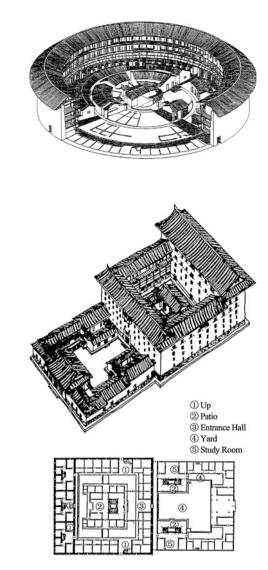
Bird's eye view (upper) and floor plan (bottom) drawings of the Yijing Building in Yongding County, Fujian. The Yijing Building is a famous square-shaped earthen building. The structure of the main body with the "---" type five-story rear part and the "]" type four-story front part surrounds a central single-level building. In front of the main body, there is another building of one or two floors, which form a courtyard. Source Lu (2003: 581)
